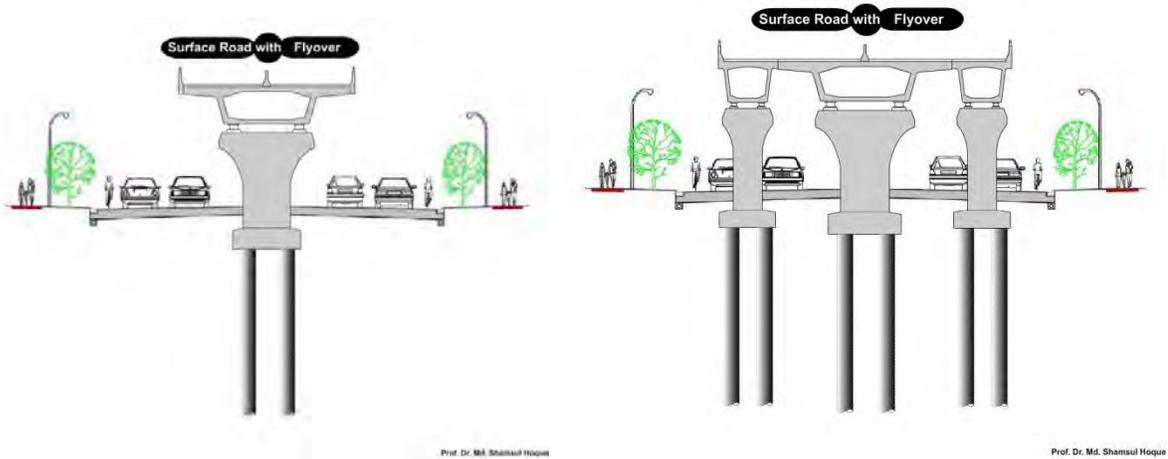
Elevated Highways and Flyover Piles and Foundation With Respect to At-Grade traffic, a) Typical Cross Section of Flyover, and b) Typical Cross Section of Flyover Along With Entry Exit Ramps.
